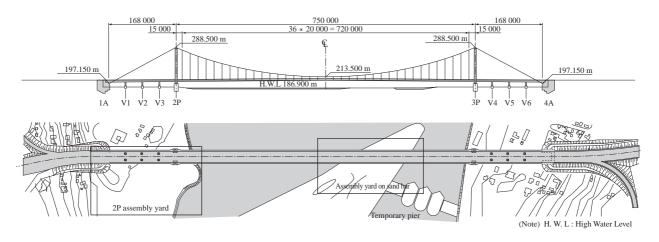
General view of "Irtysh River Bridge" (unit : mm)
